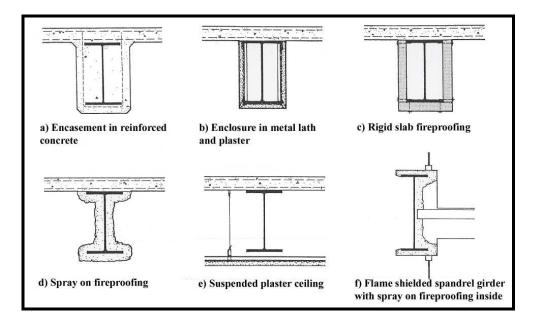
Some methods of fireproofing steel beams and girders (Allen, 1999:391).
